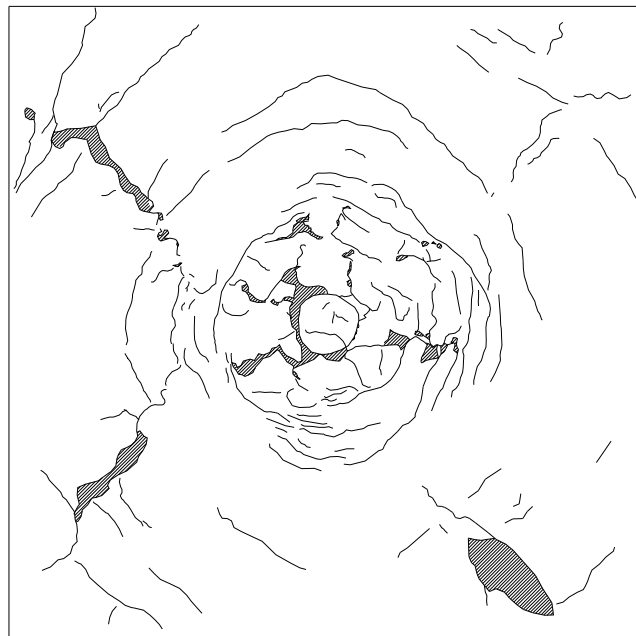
Crack profile of the loading face of specimen YA150a after testing
